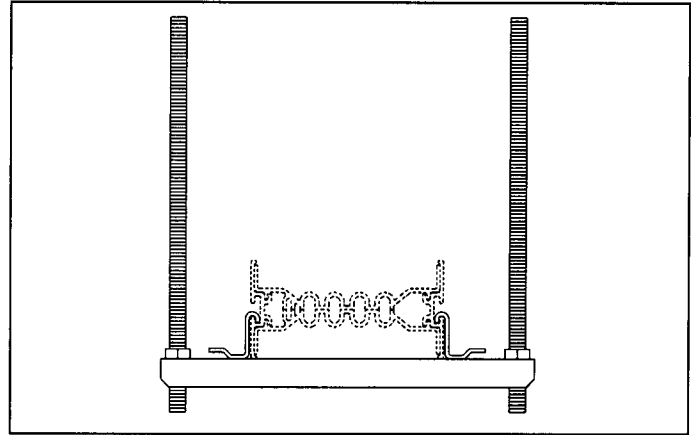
Trapeze Hanger for Edgewise Mounting
